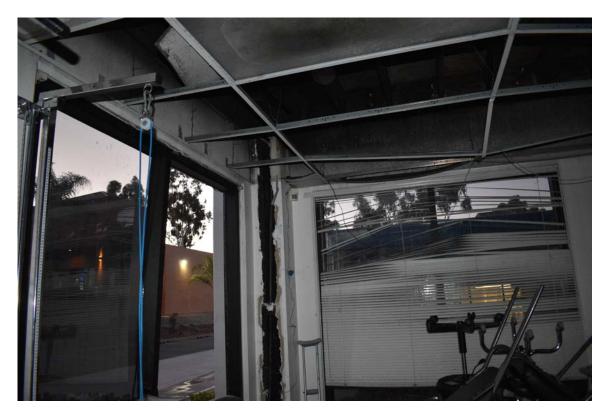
Alpha – Bravo corner; area of origin of fire. ABS pipe and electrical conduit present.
